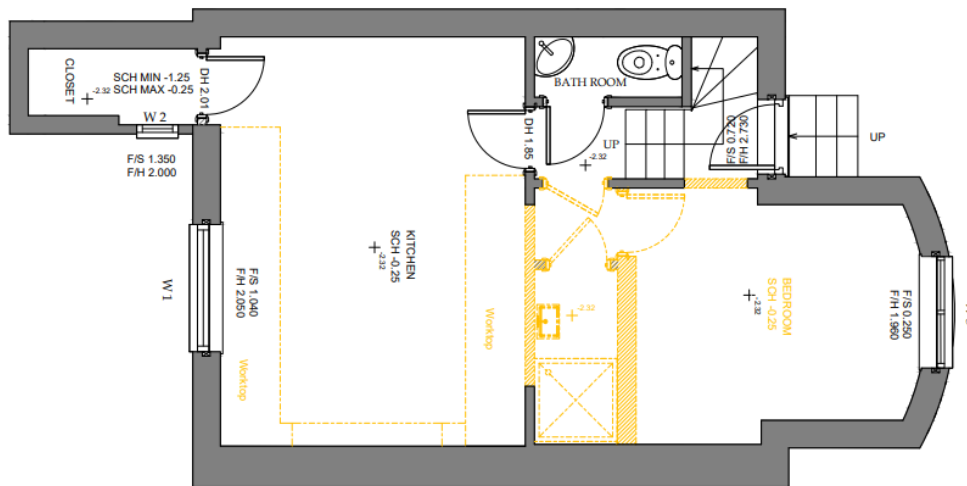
No. 5's internal lower ground floor floor plan, showing elements consented for demolition (in yellow) and indicative historic plan form (ref: 21/AP/2418)
